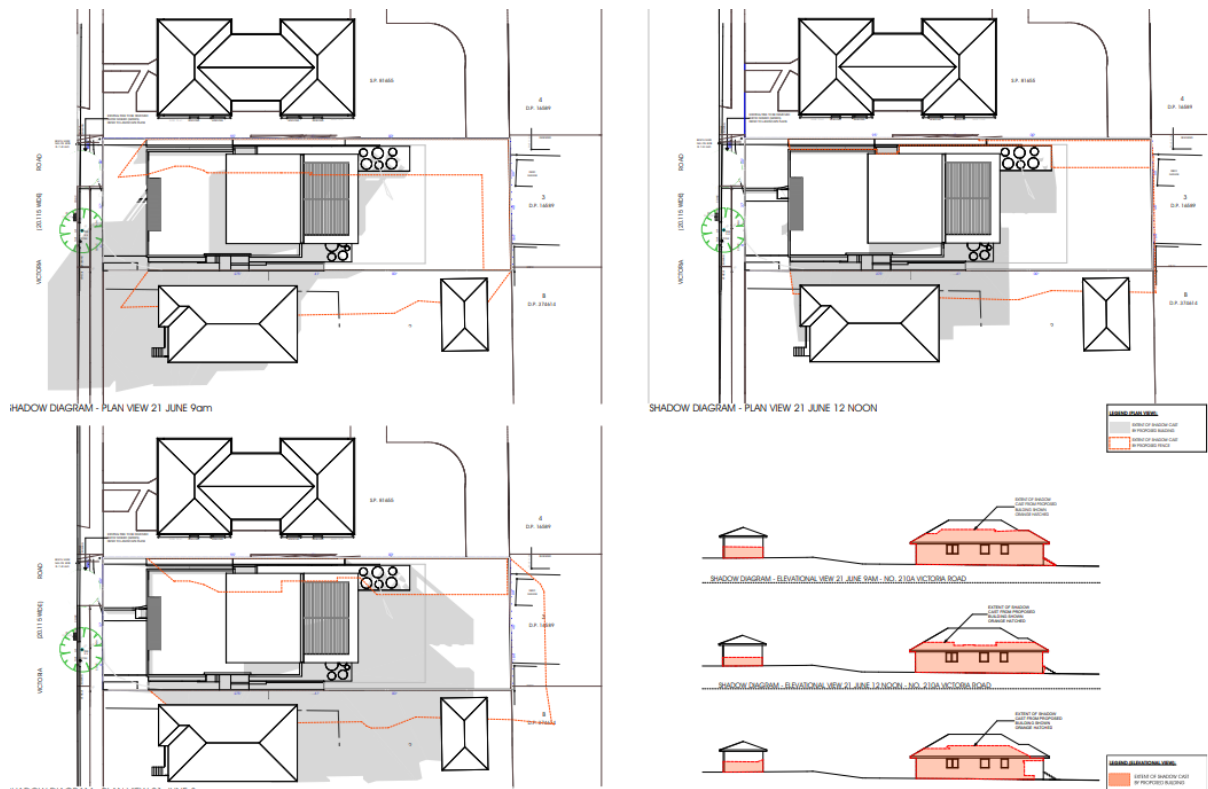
The proposal has been designed to provide reasonable levels of solar access to adjoining properties by proposing a centrally positioned and smaller first floor building footprint. It is noted that it is always difficult to retain solar access to adjoining properties due south on an west to east allotment (Source: Design Building Group, 2023).
